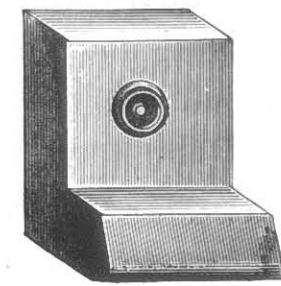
Wrought-welded Iron Boiler for closed Range.
